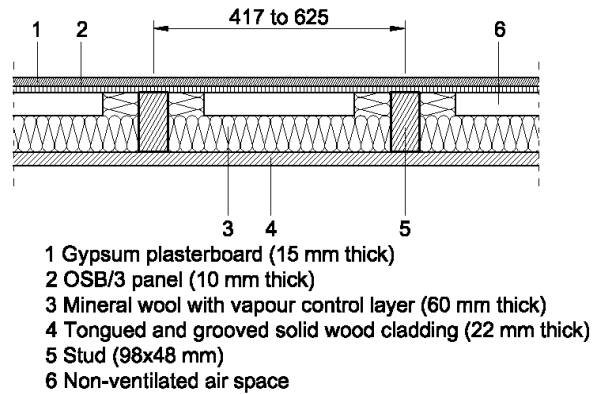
Horizontal cross section of external walls with external timber cladding and internal gypsum plasterboard.
